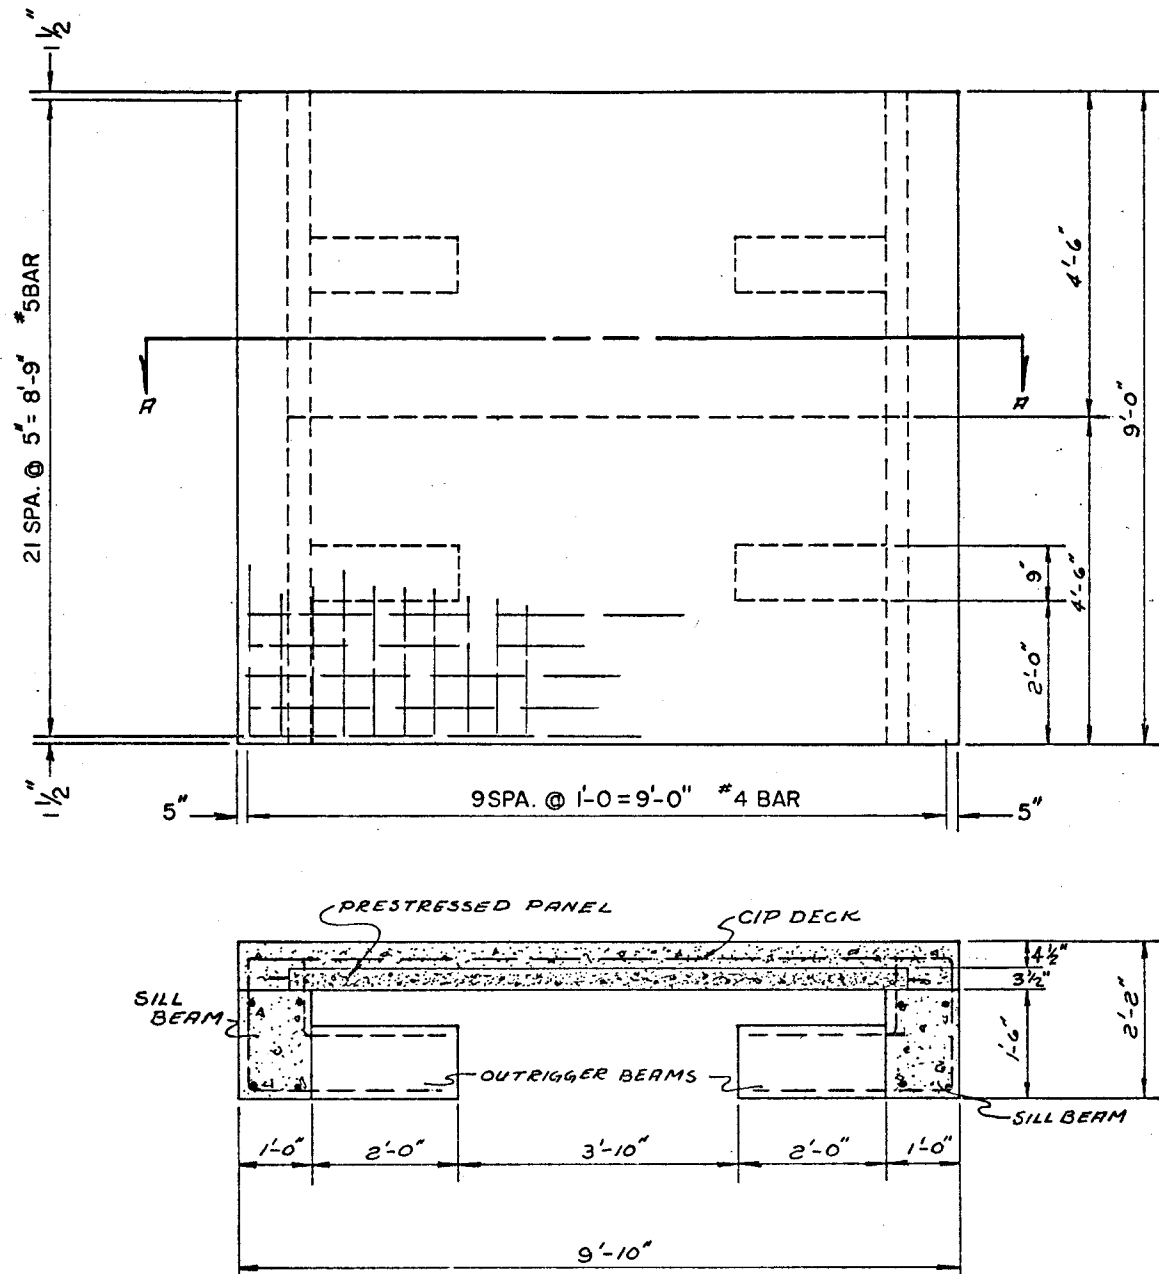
Dimensions and layout of simulated slab segment for loading no. 4.
